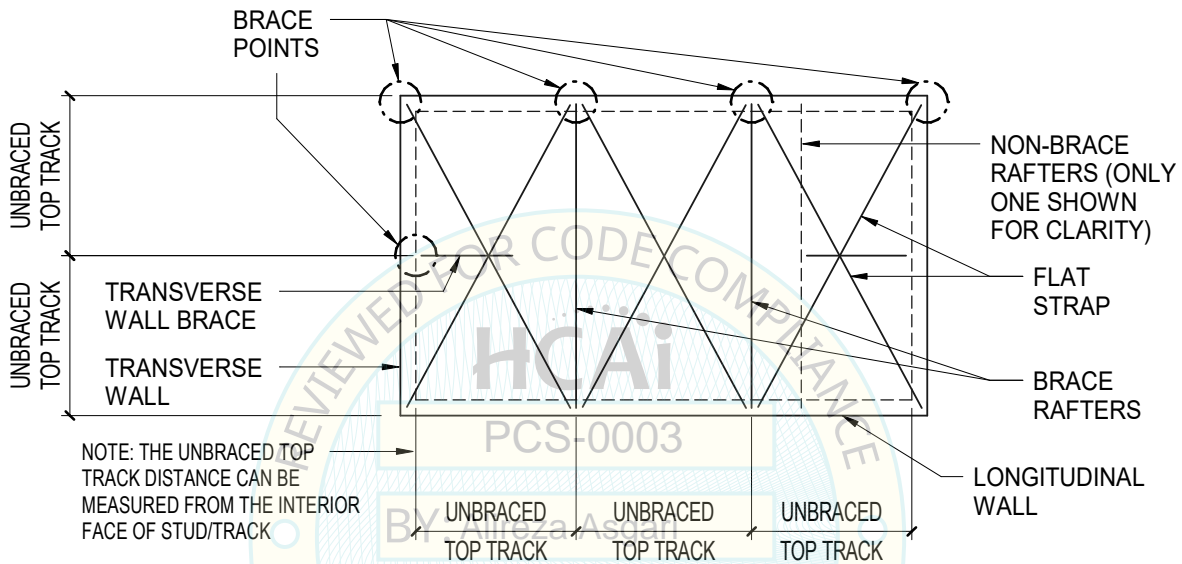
Pod Ceiling Diaphragm Layout
